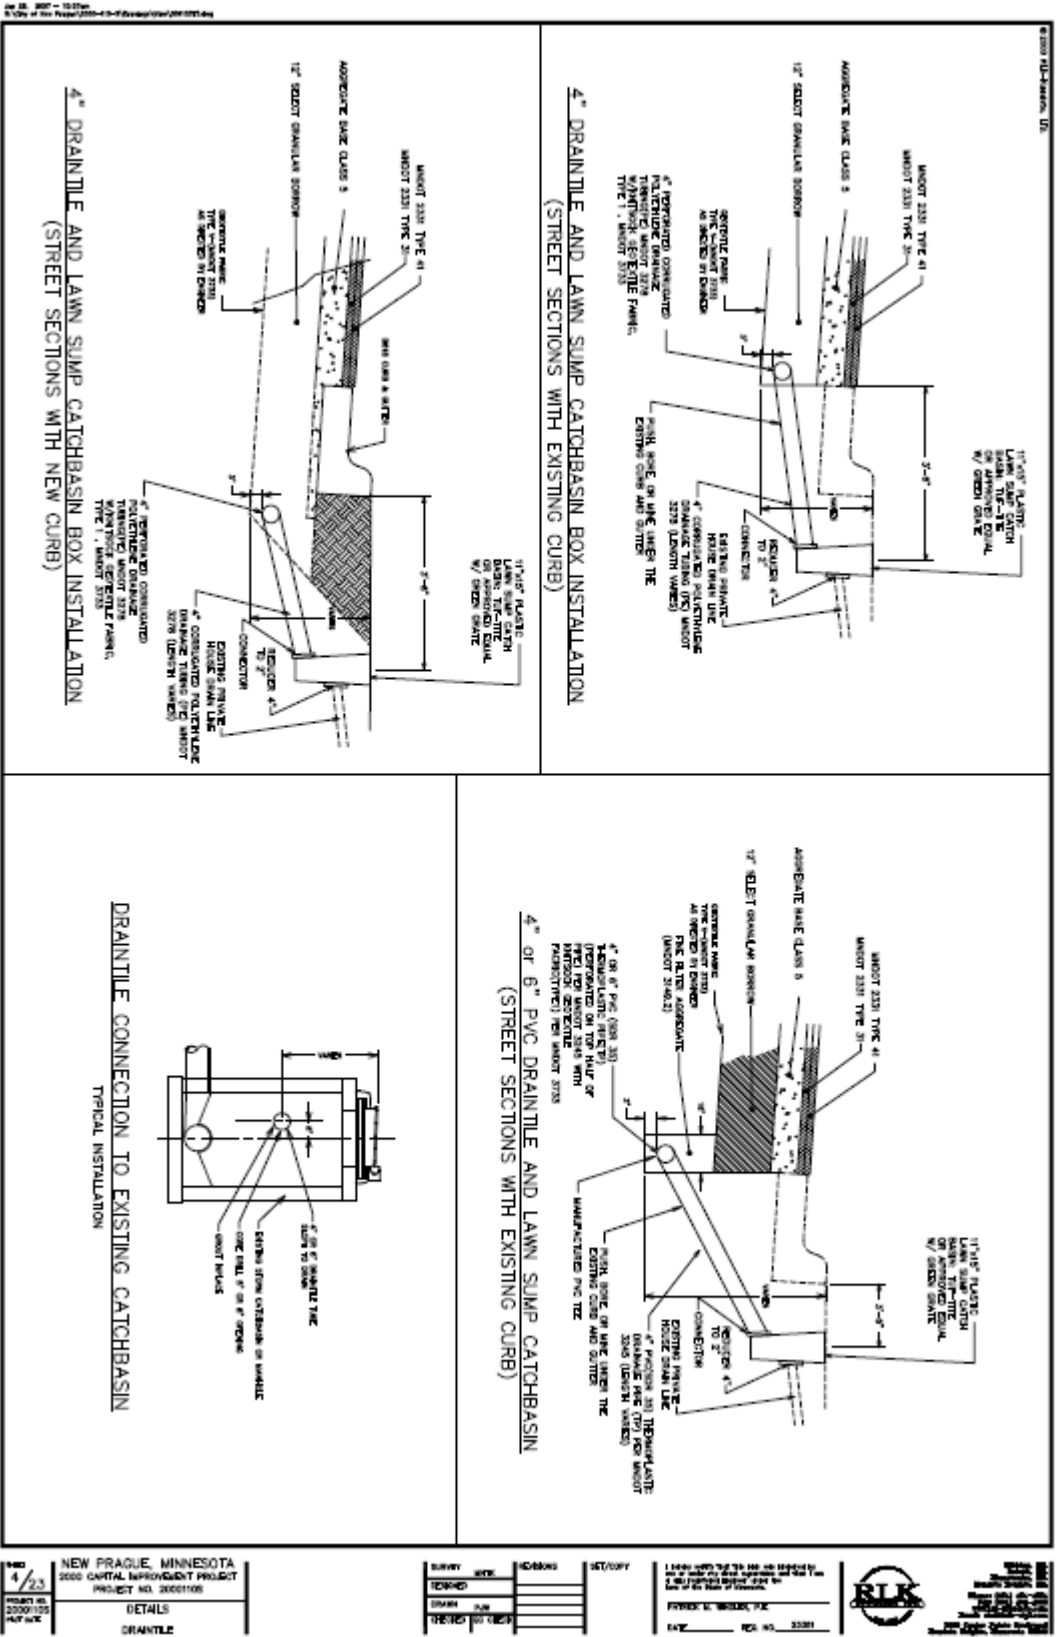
Draintile and lawn sump box installation (Mn/DOT, 1994b).
